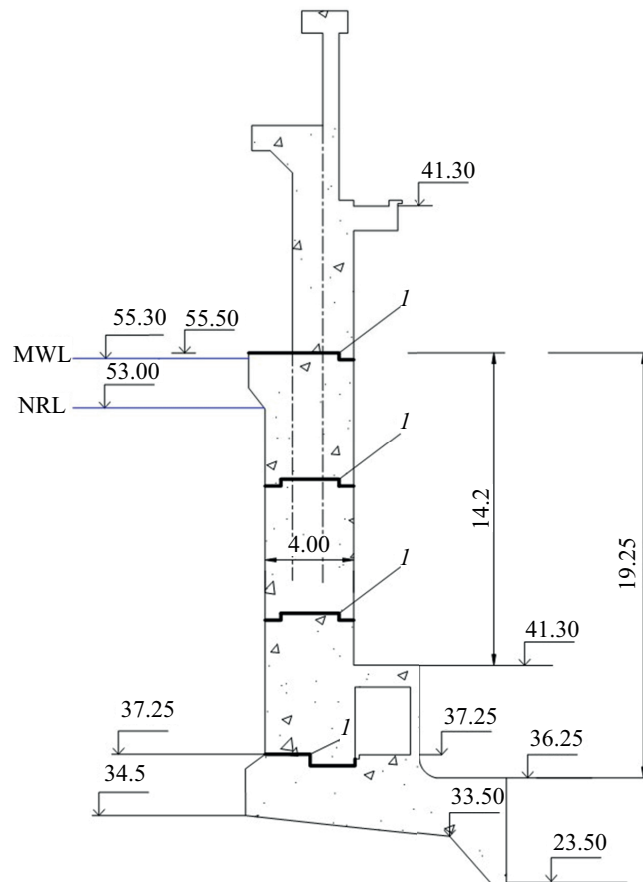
Construction joints between the concrete pouring sections of the machine hall headwall (dimensions in m): *I* — intersection construction joints
